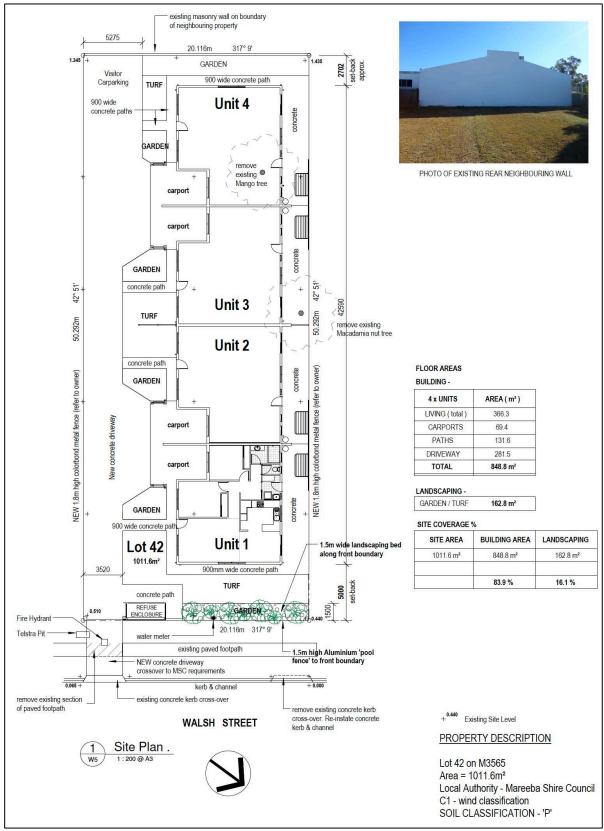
Extract from Site Plan (Prepared by Allan Ballard)
